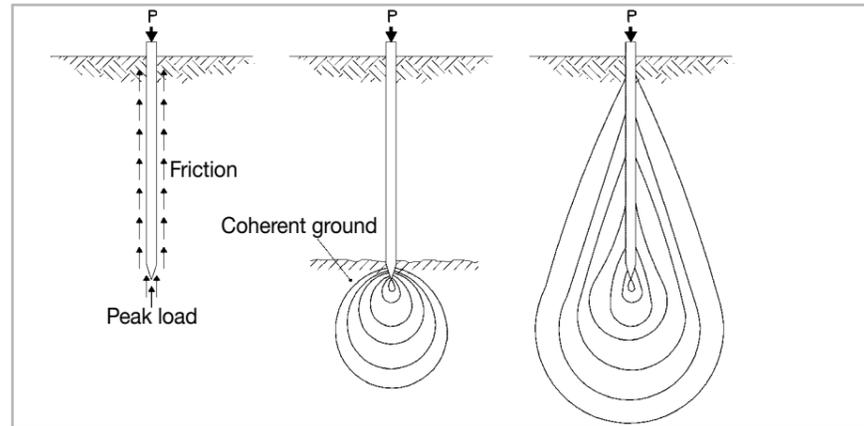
Schematic diagram of strains acting on a foundation pile
